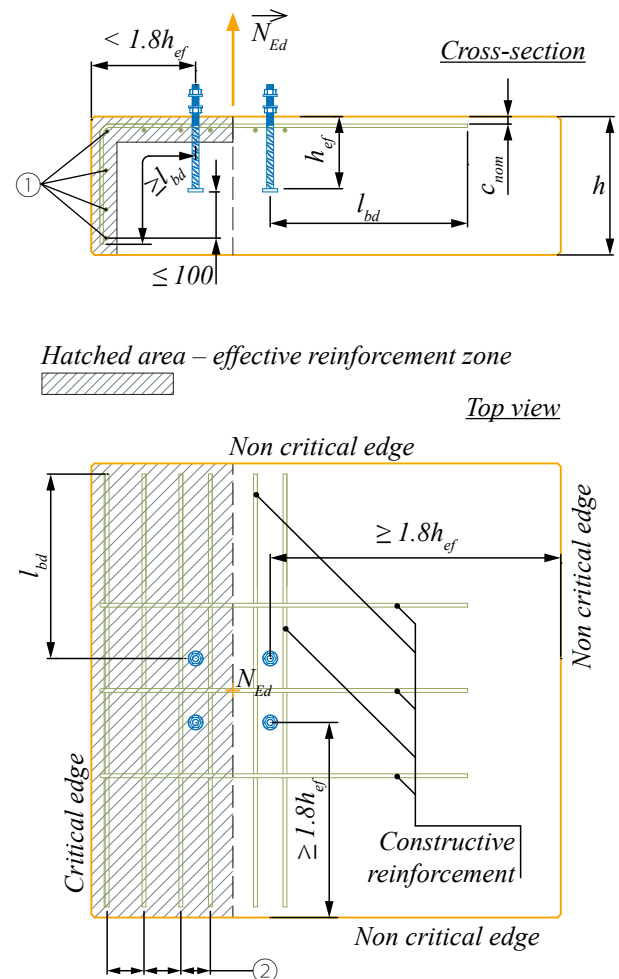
Detail for splitting reinforcement. Example case with one critical edge.
